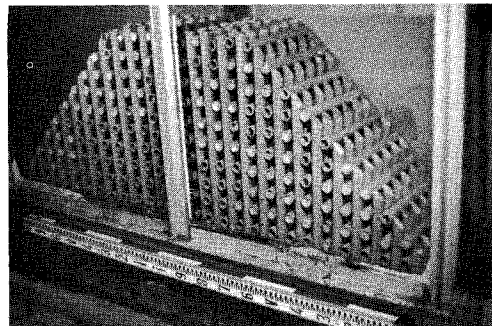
Model Breakwater Made of Lattice (Trapezoidal Cross Section)
